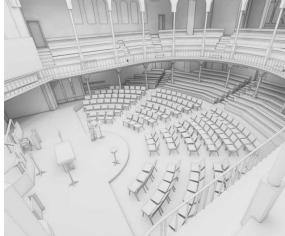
Perspective from the lower auditorium illustrating proposed contemporary screen and new low wall to stage. Source: Trethowan Architecture, 2024.
